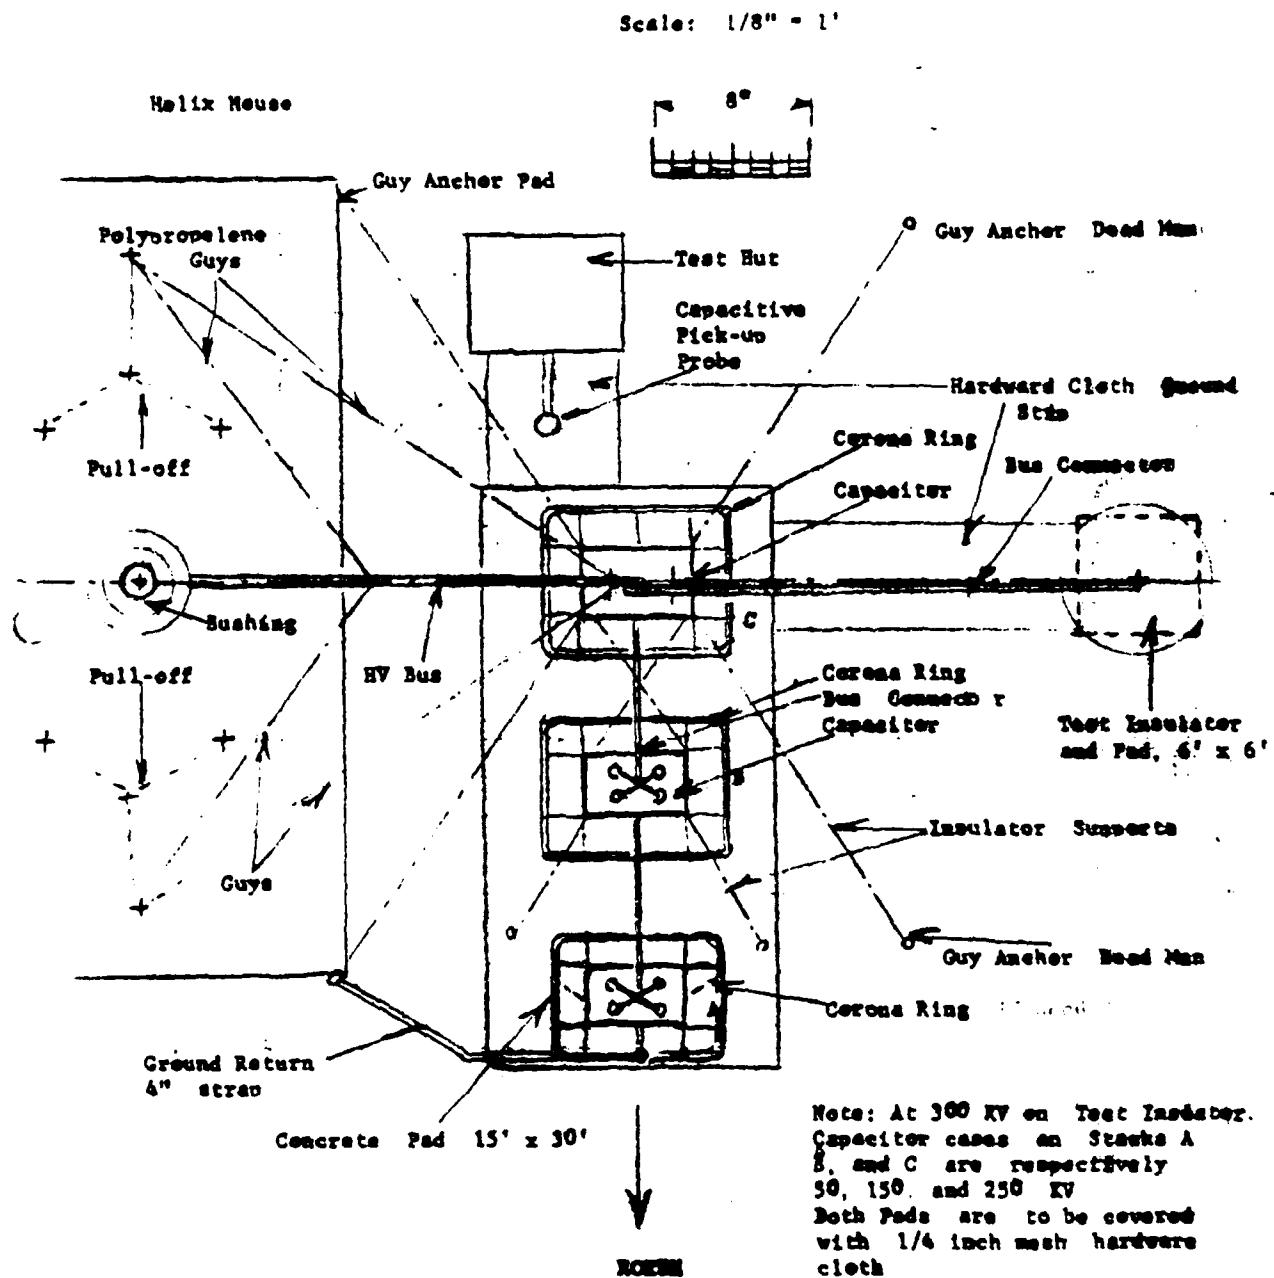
Plan View of Capacitor Bank and Test Insulator Installation
